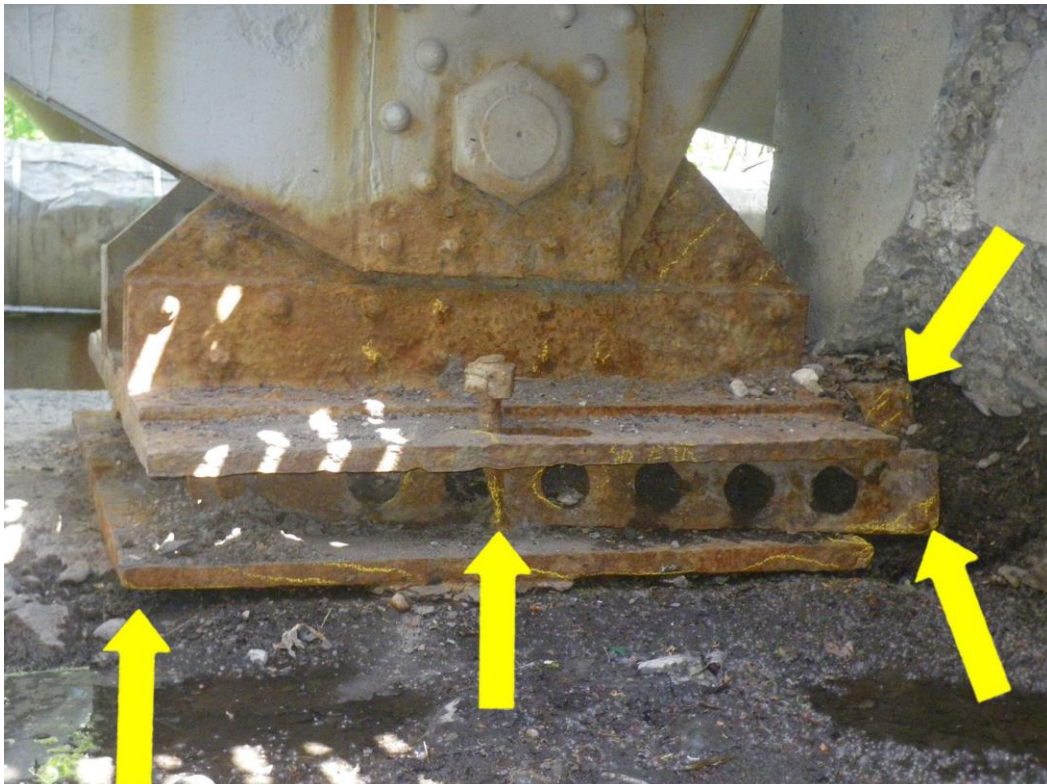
East Truss Bearing at South Abut., West Face, Span 4 - Nested roller assembly twisted, expanded beyond masonry plate edge, in contact w/ backwall & detached vertical plate. Note anchor bolt severely bent w/ section loss and in contact w/ sole plate slotted hole edge, & angle section loss w/ rivet head loss.
